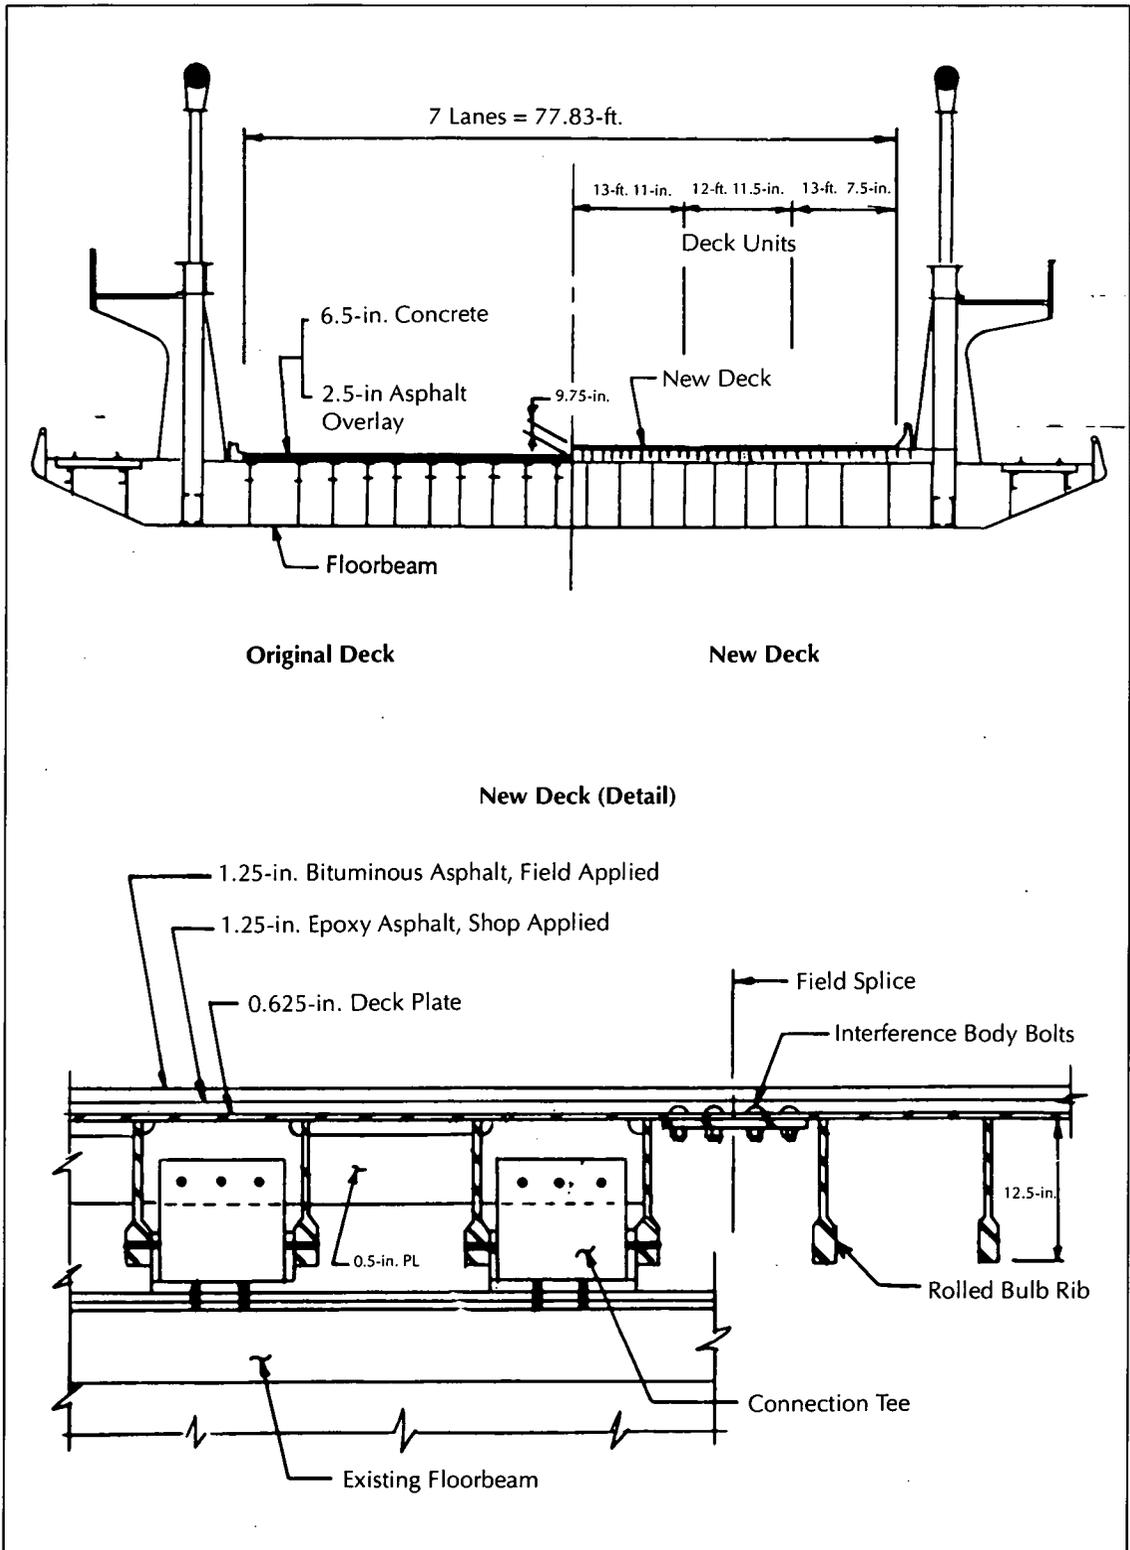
The orthotropic steel deck for the Benjamin Franklin Bridge.
